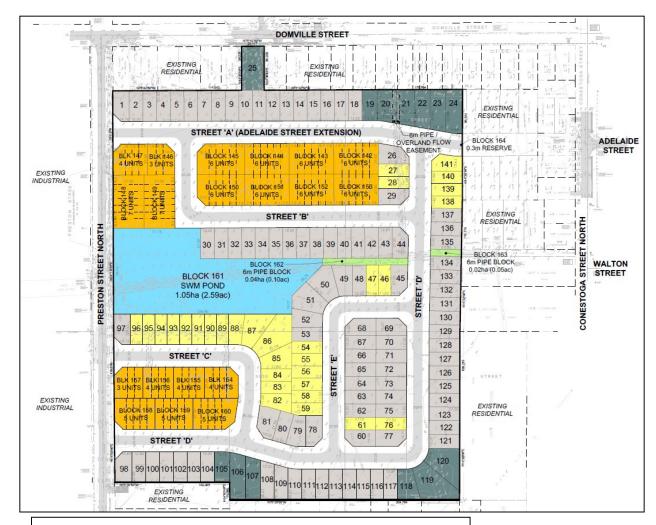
Proposed Draft Plan of Subdivision (Source: Glen Sschnarr & Associates Inc)
